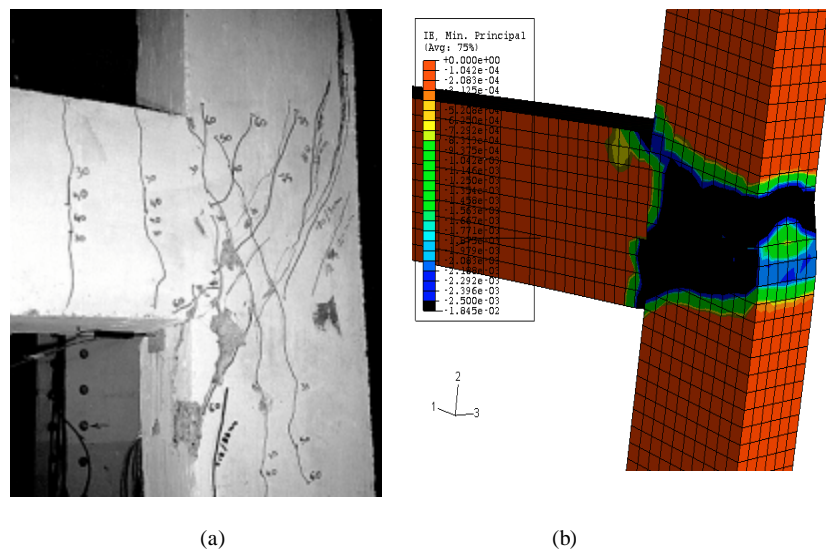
Damaged concrete zones: (a) Experimental; (b) FEM
